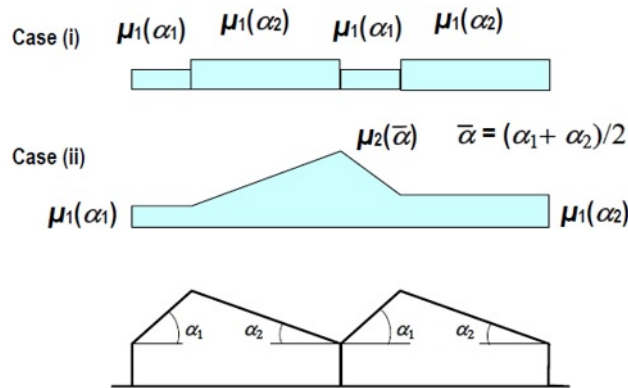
Fig. 5.4 in [35]: Snow load shape coefficient for multi-span roof for straight roof elements (pitched roofs)
